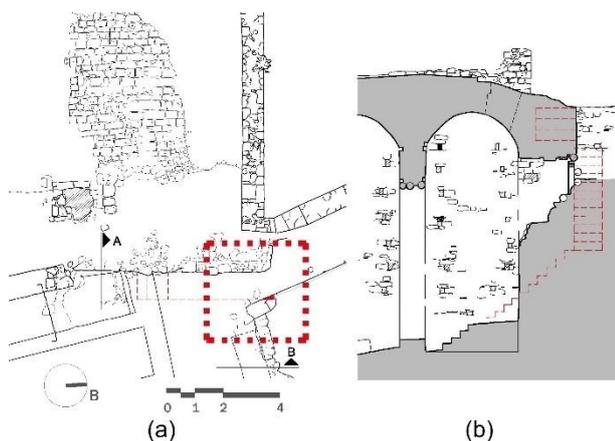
South Tower's survey plans with special indication of the staircase corner trace: a) ground plan; b) transversal section.
